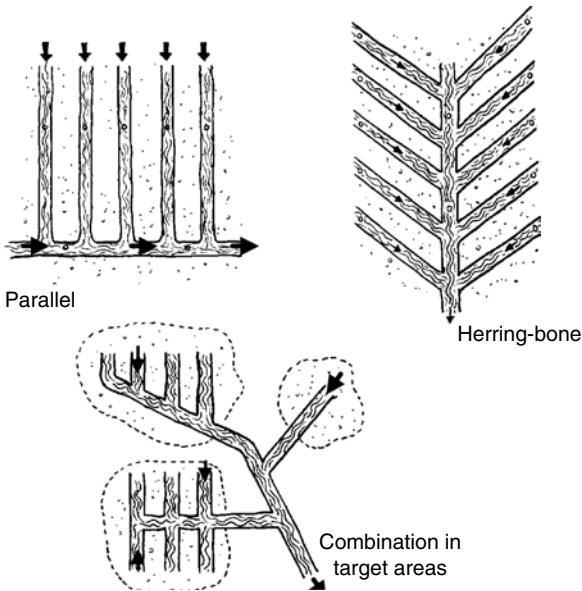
Alternative drainage system layouts. (Drawing by R. Castro.)
